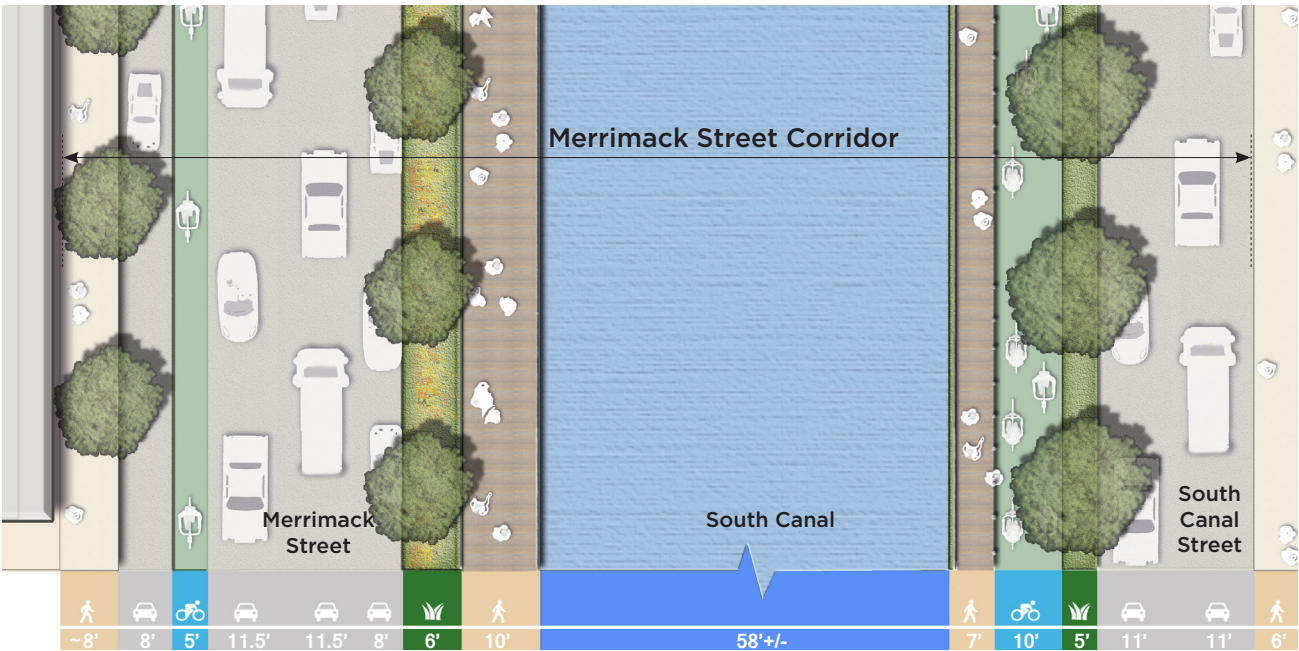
Section View: Proposed Treatment of the Merrimack Street Corridor. This is the preferred alternative for Merrimack Street from South Union to South Broadway.
